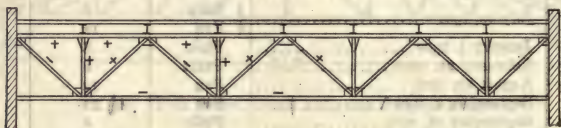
Warren Truss with Verticals. Span Fifty-six Feet
